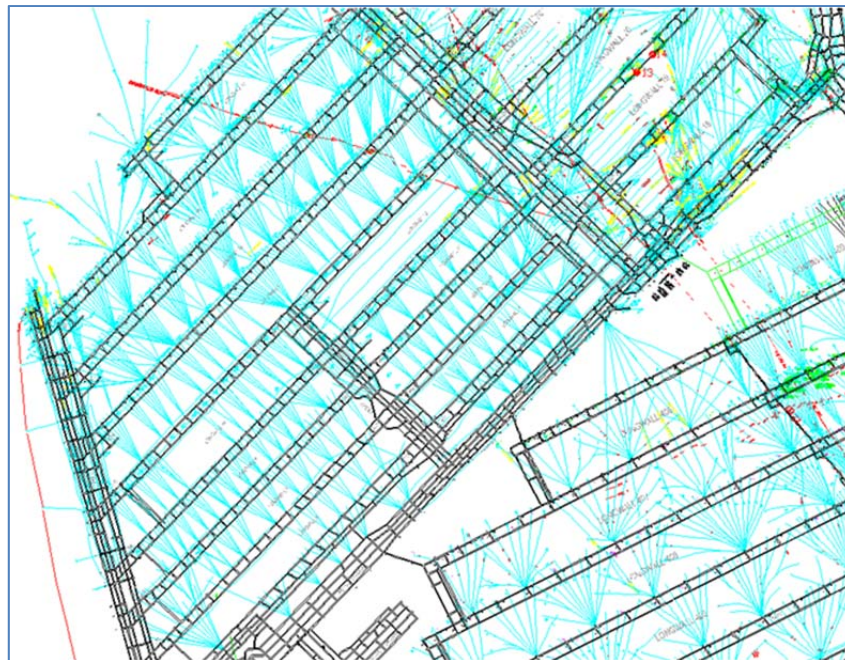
Typical Layout of UIS Boreholes used in Bulli Seam Gas Drainage
